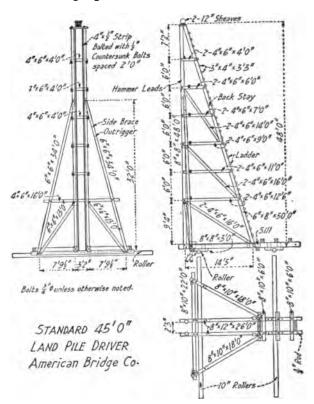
DETAILS OF STANDARD PILE DRIVER. AMERICAN BRIDGE COMPANY.
